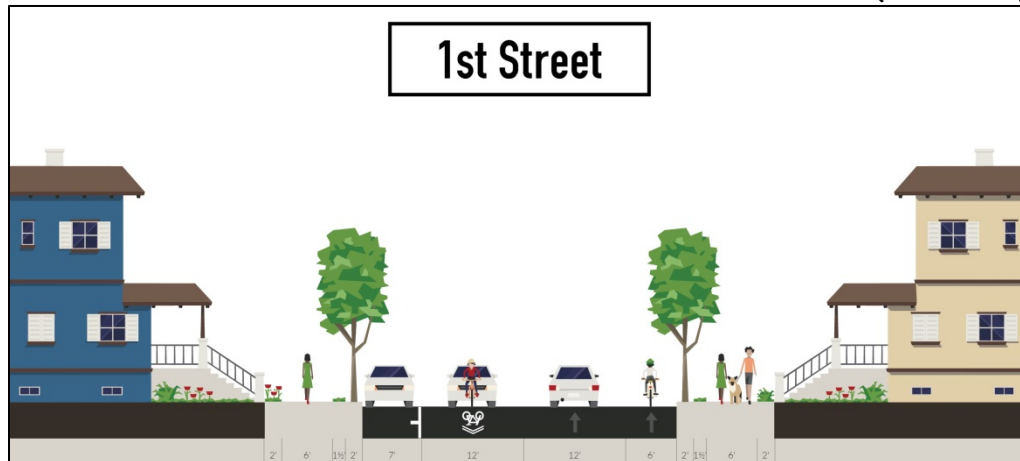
First Street Cross-section - Alternative 2 Commercial (60 Feet Right-of-Way)
